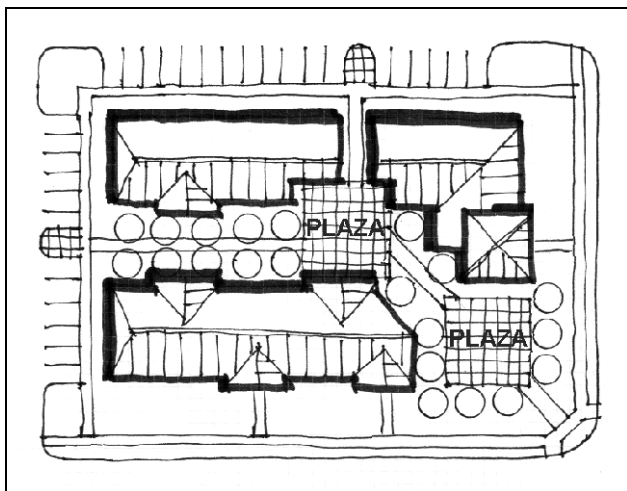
Office buildings oriented to street and to plaza or green space become important elements of the streetscape.
